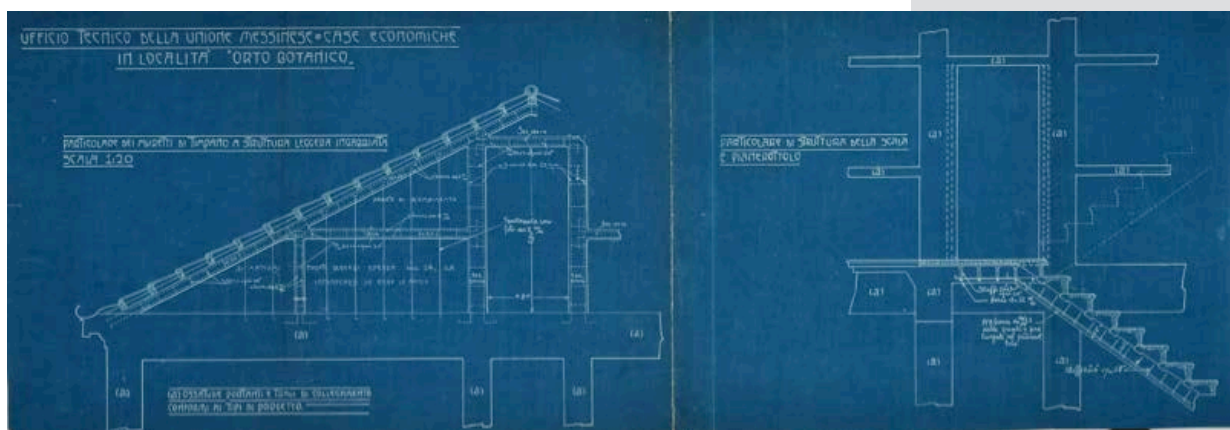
Messinian Union Housings, project variation for a reinforced concrete beamed roof; stairslab project [9].
